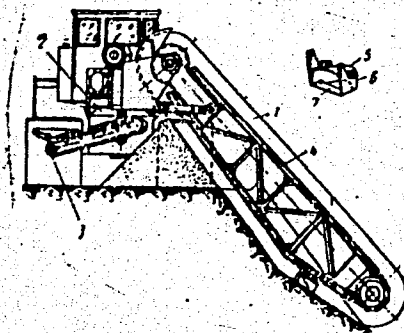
1 - Working member with numerous buckets, for transverse excavation; 2 - supporting-turning platform; 3 - carrier; 4 - frame of the working member; 5 - bucket; 6 - open body; 7 - blade.
